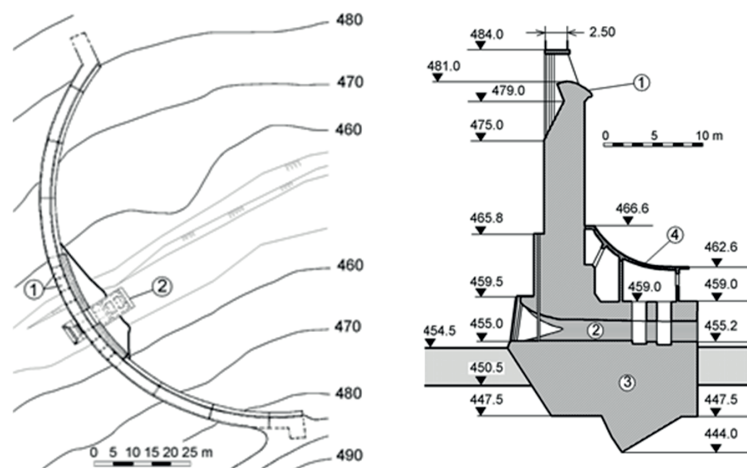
Layout and typical cross section of the arch dam ‘Lipkovo’
